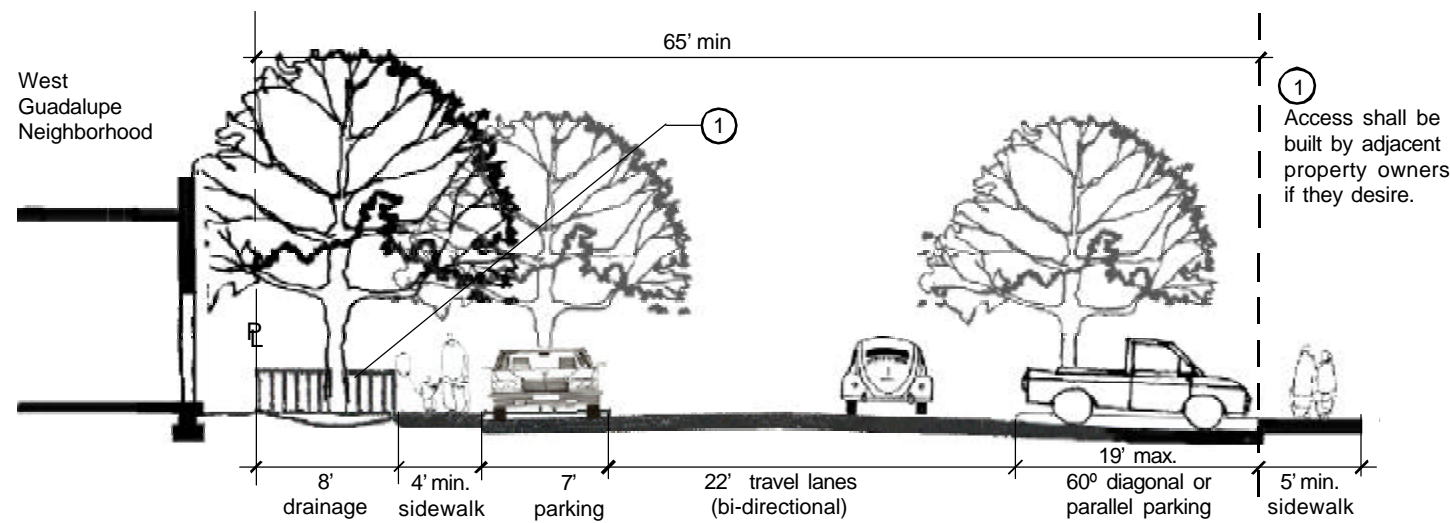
Road Section I -- Entry Road from Montezuma Street
